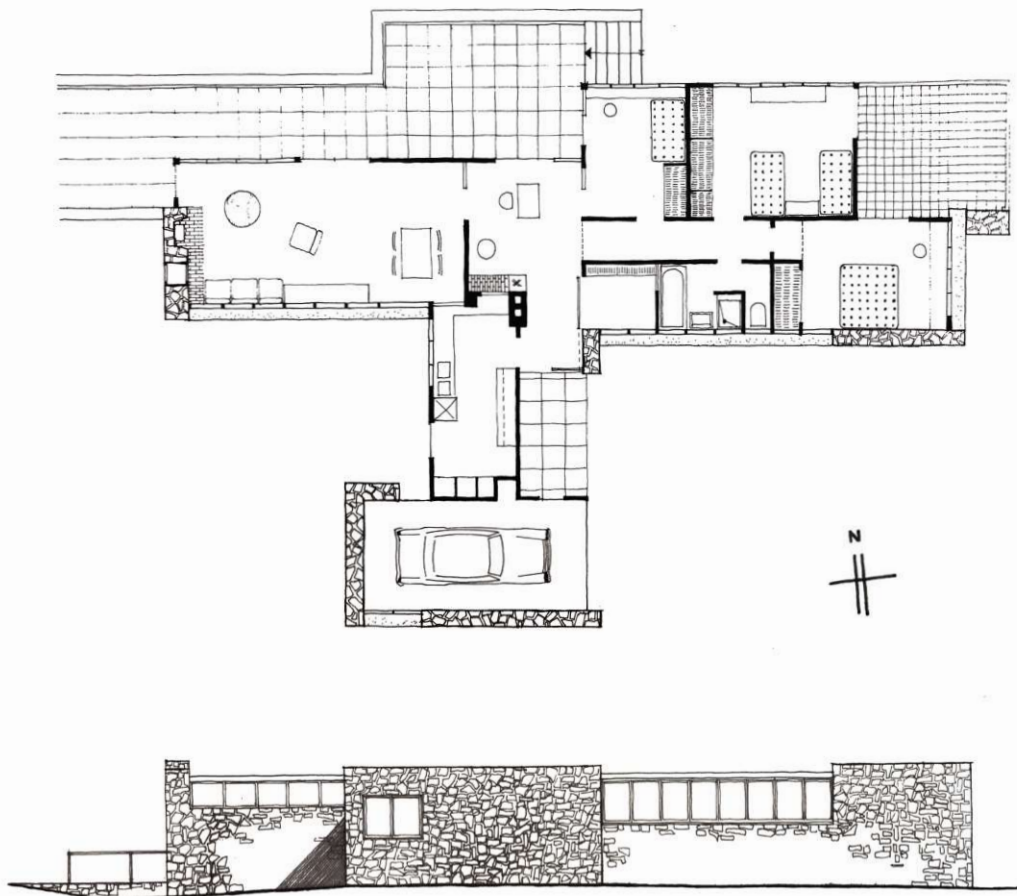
House Henderson, 1950 - floorplan & elevation
